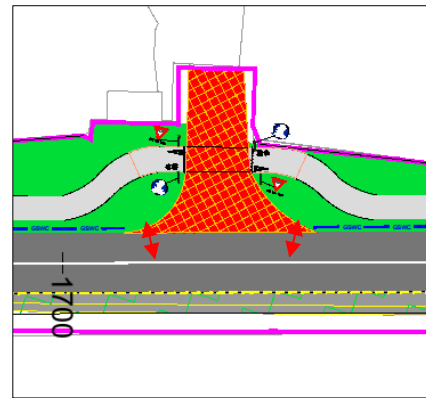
Finner Camp Access (Drawing 11199-08-1012-B)
